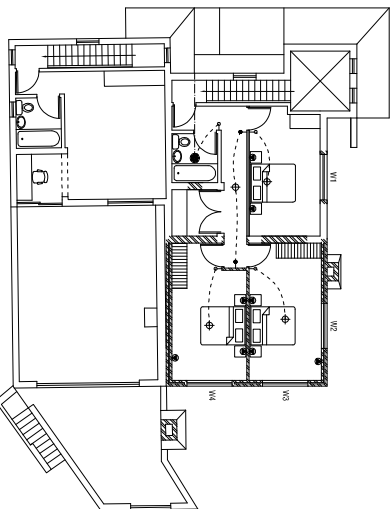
, KLENMOND - BUILDING LINE DEPARTMENT
